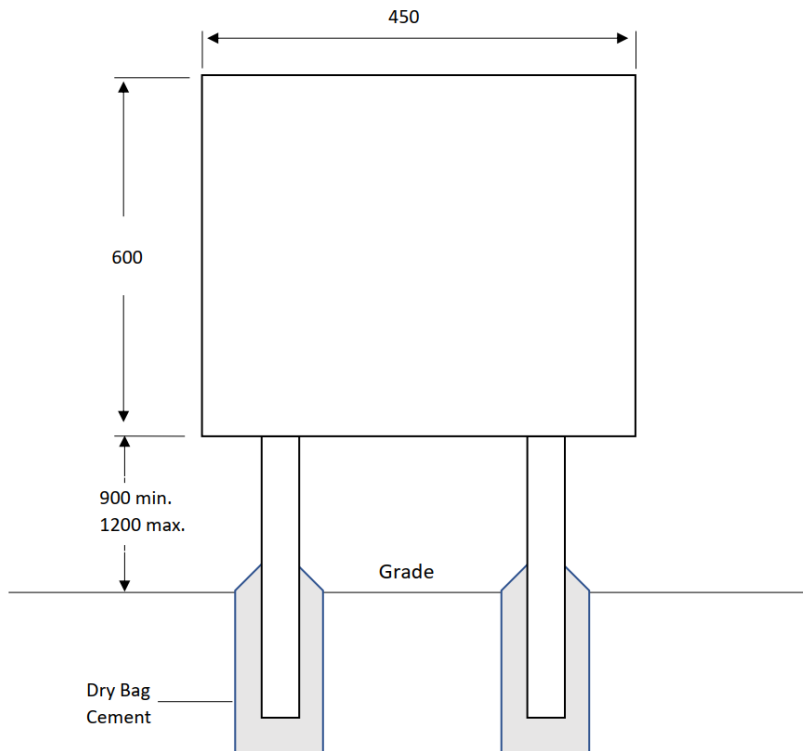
Sign Dimensions for Standard Official Plan and Zoning By-Law Amendments
